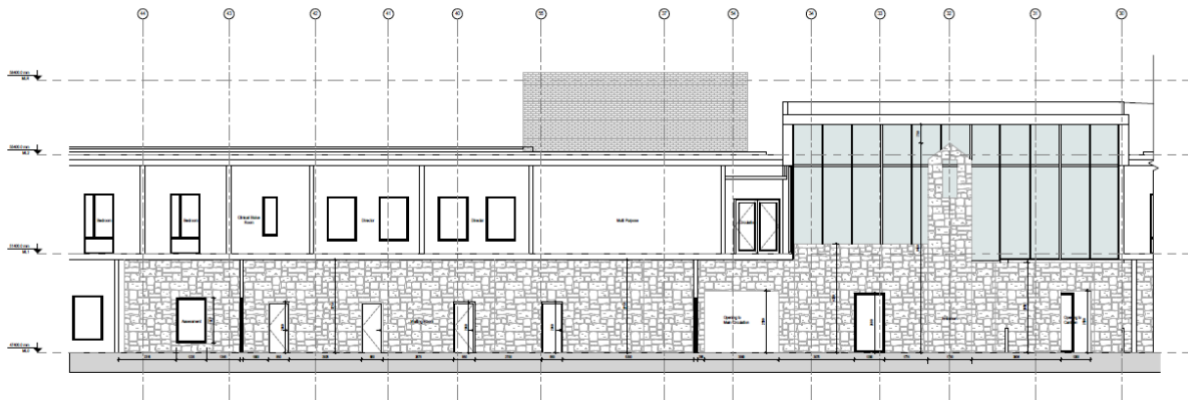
Proposed east elevation, Part 1. Source: TOT Architects
